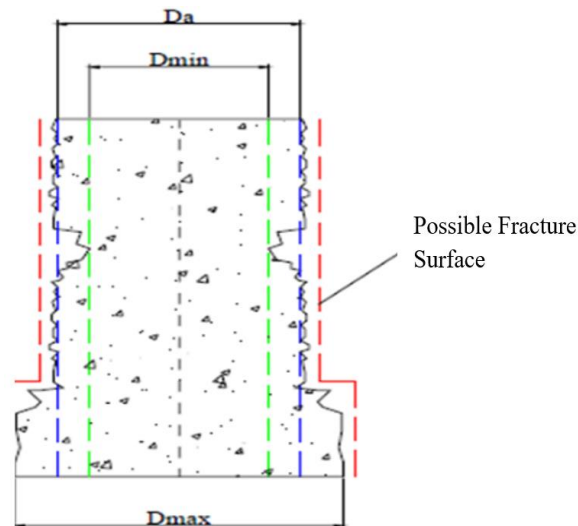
Possible slip surface in the Jet grout column manufactured in the ground [10].
